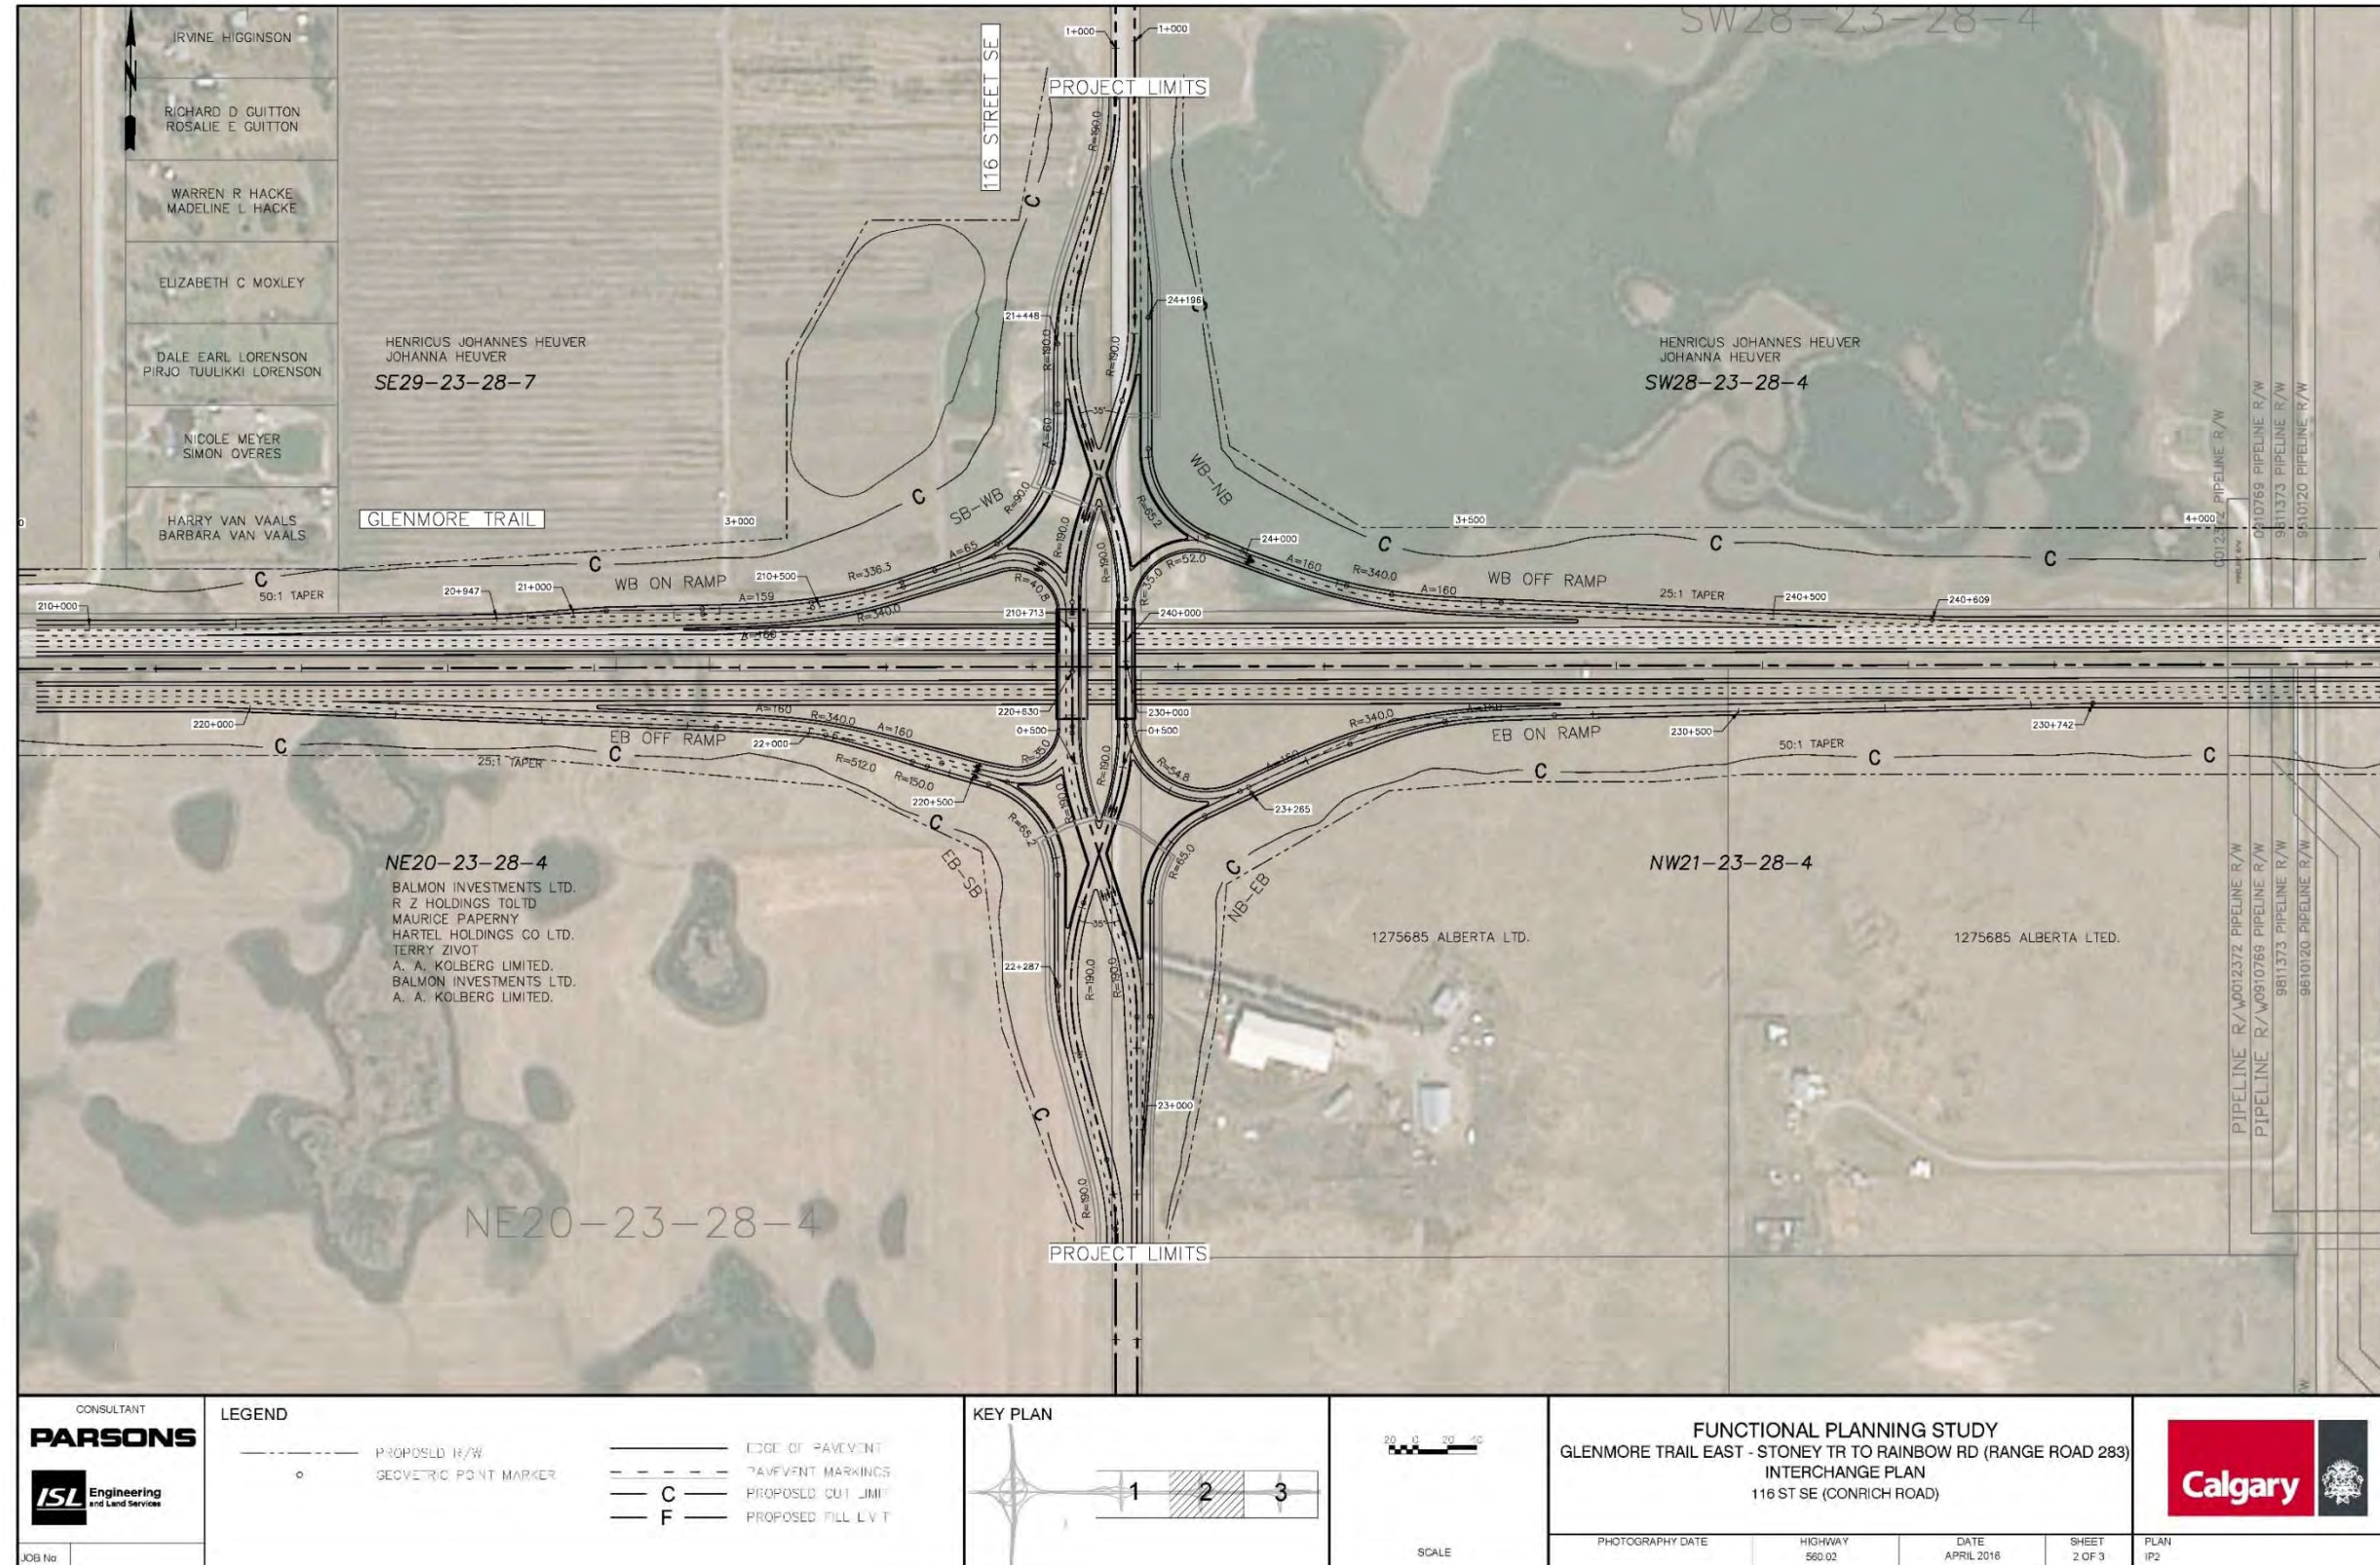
RECOMMENDED PLAN - 116 ST SE
